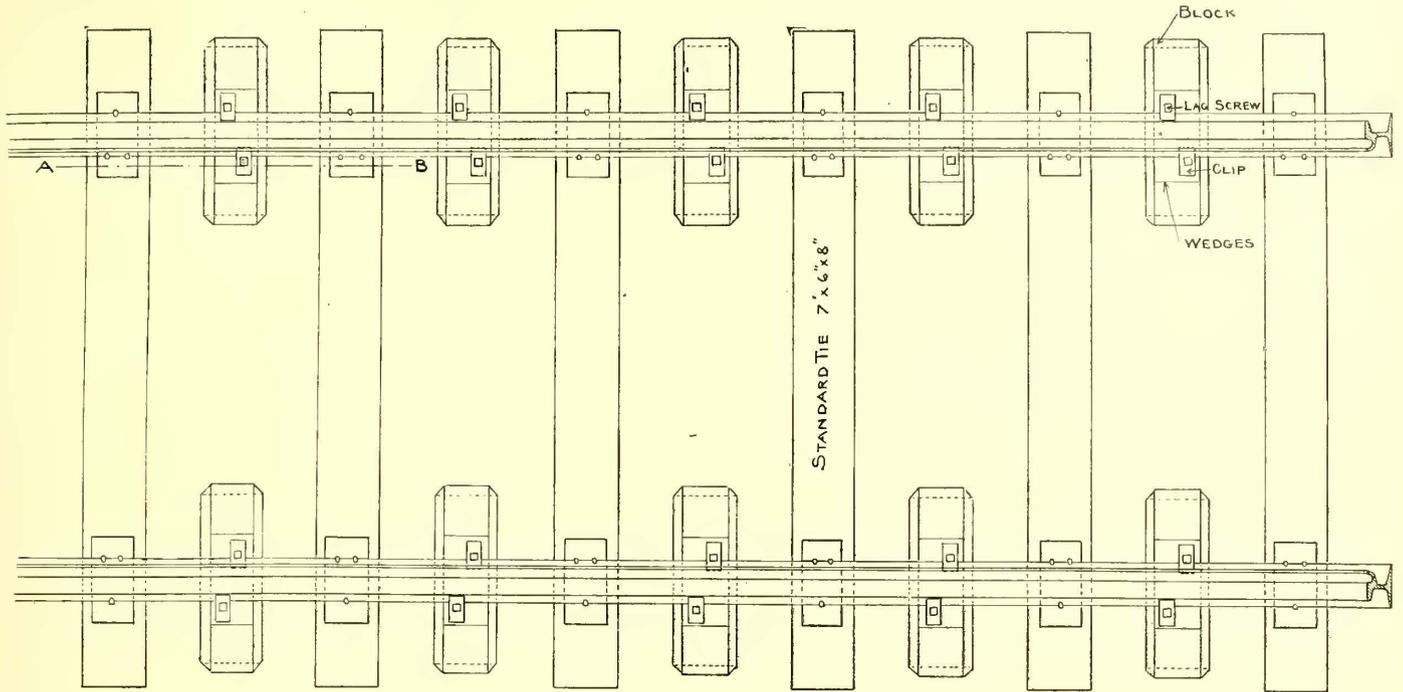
CROSS-SECTION OF TRACKS IN SPRINGFIELD STREET, CAMBRIDGE
